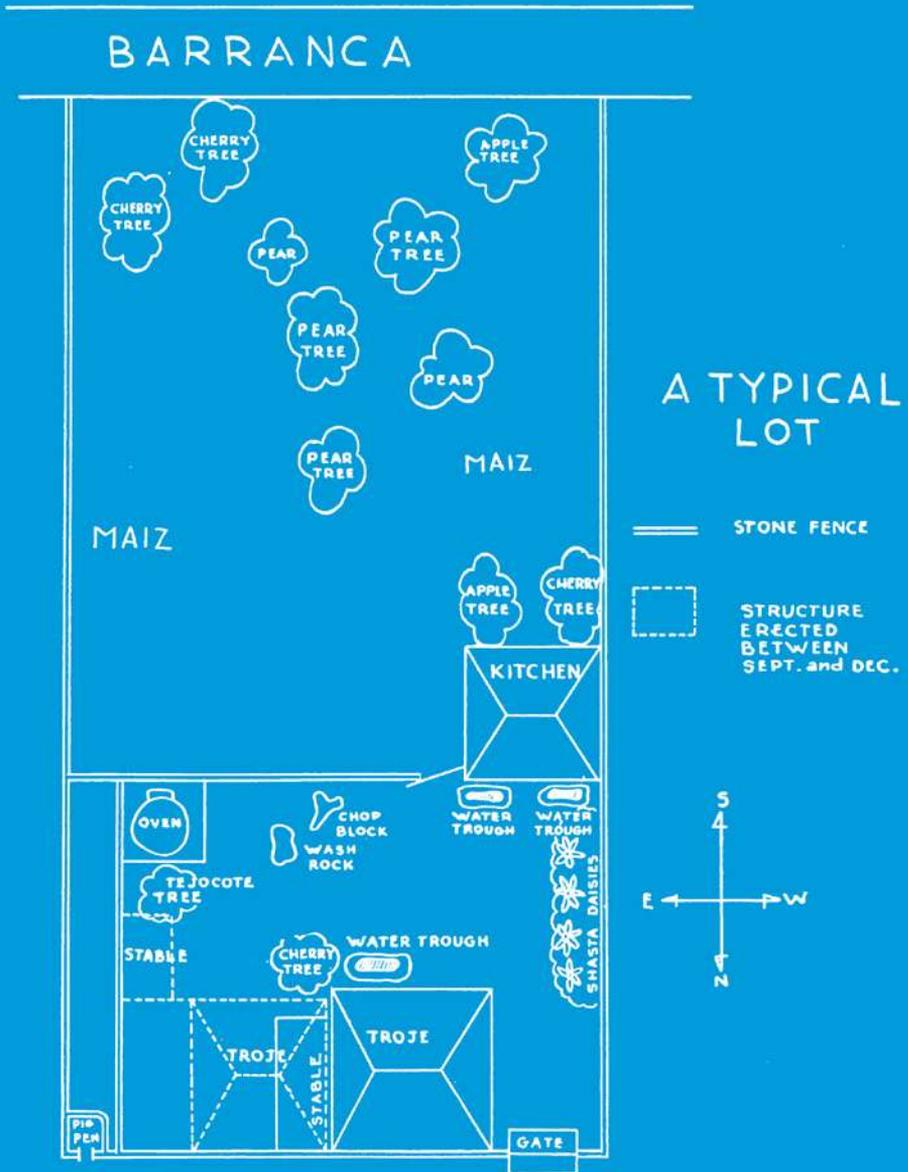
Plan of a typical Cherán lot in the southeast section.
